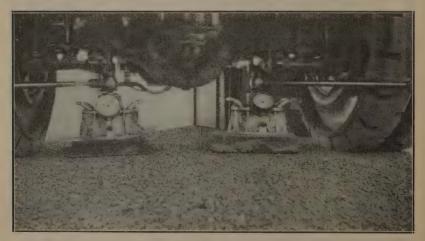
Plate XLV. State Highway, heavily loaded truck, loadometers under rear axle.
